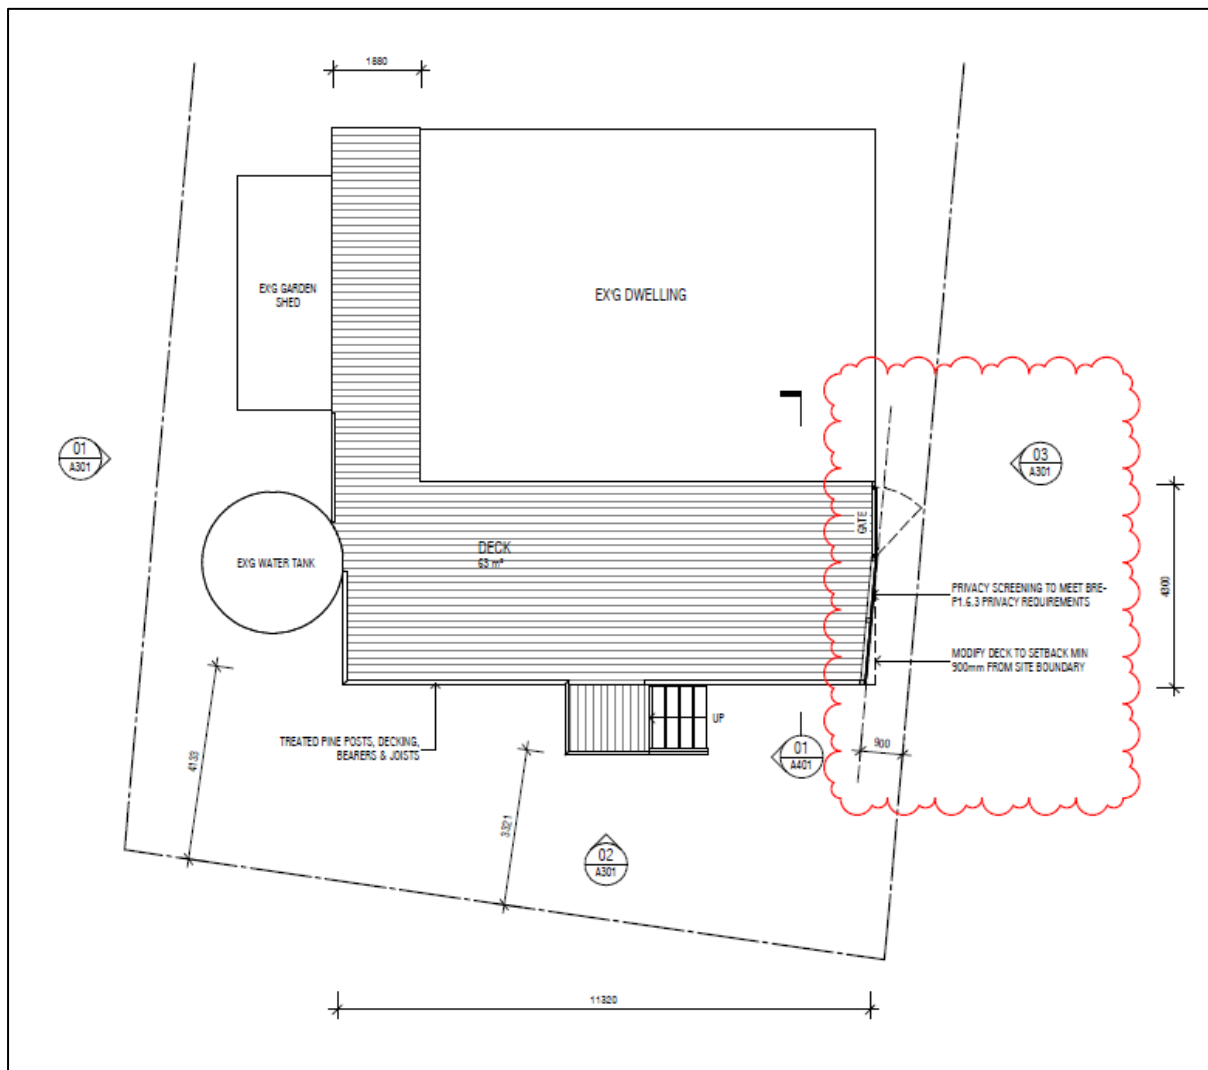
Floor Plan – Existing Deck (Adapted from: Edwards + Simpson).
